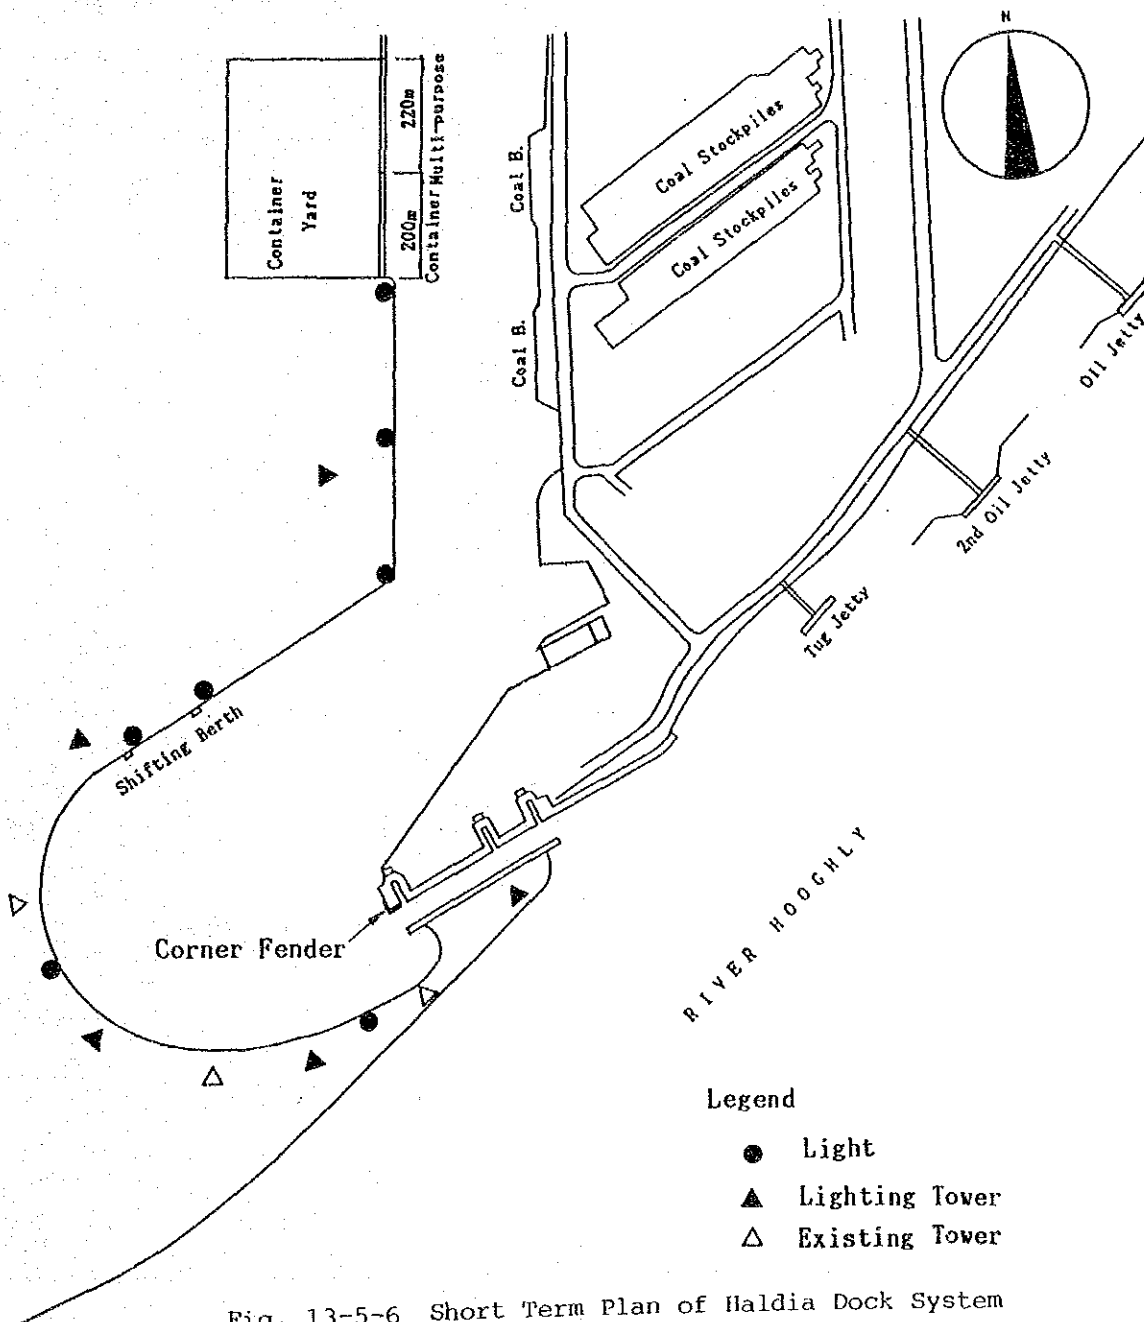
Short Term Plan of Haldia Dock System (Lighting for night navigation)
